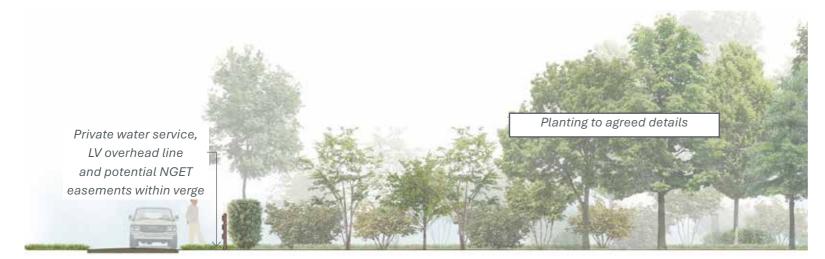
C: Section through Ardleigh Road, facing west, close to the attenuation ponds.
